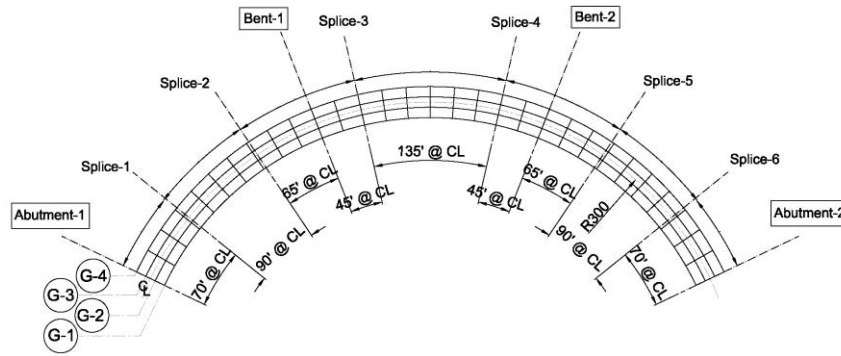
Simplified Framing Plan, Bridge C10: Balanced, Three-Span, 4-Girder, 91.4 Radius, R/L=13.3
